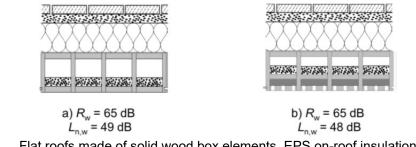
Flat roofs made of solid wood box elements, EPS on-roof insulation, roof sealing and concrete plates in the gravel bed: a) Box element with 50 kg/m² grit filling b) Accustic element with 50 kg/m² grit filling
